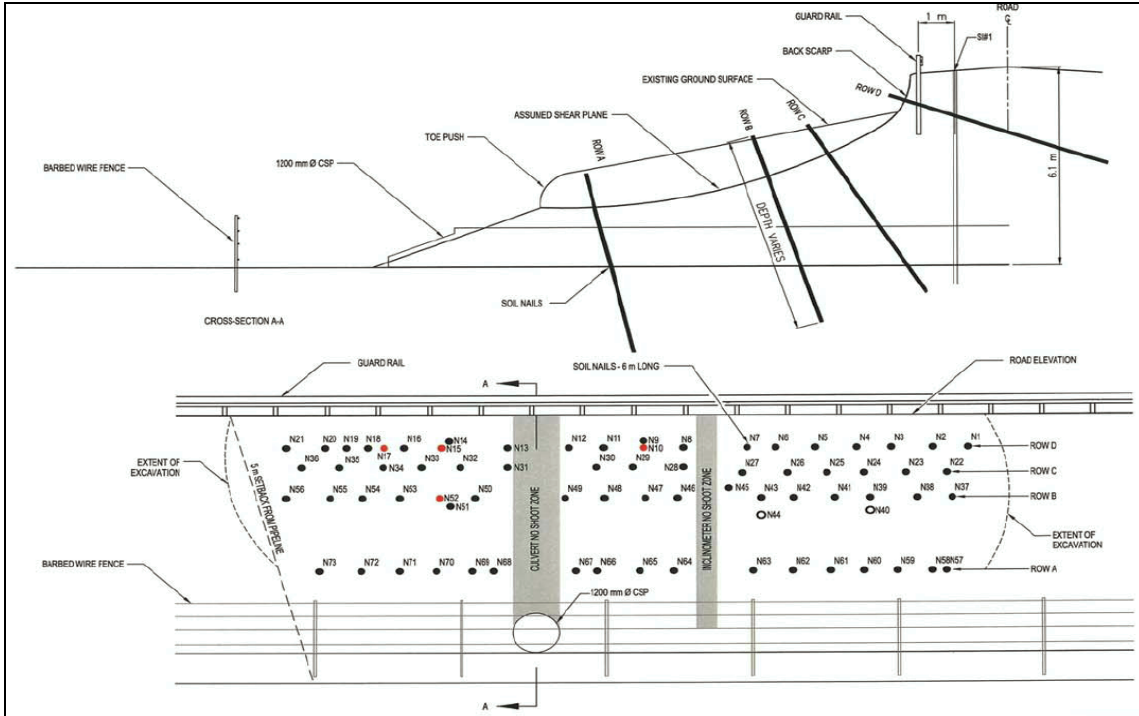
As-built of NC47 showing launched soil nails layout (not to scale)
